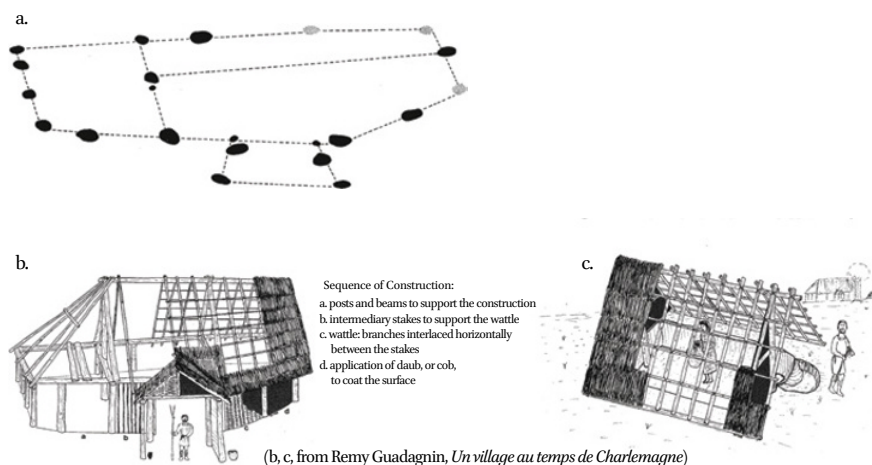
Reconstruction of rural buildings a. pattern of postholes for a building b. reconstruction of the building c. reconstruction of a 'hut' ('cabane') (Villiers-le-Sec)
